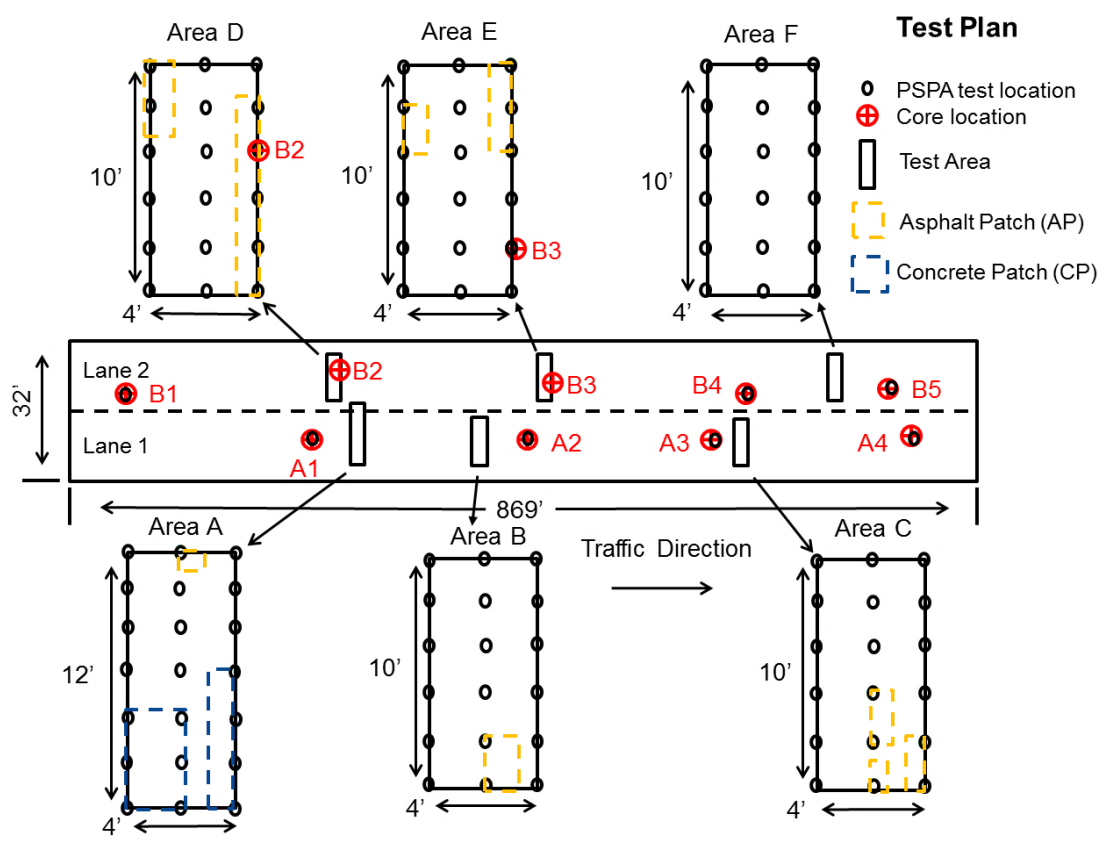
Test plan showing the PSPA test and core locations on the bridge deck.
